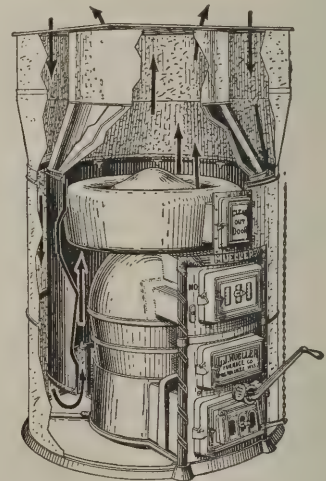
Broken View Showing the Mueller Pipeless Furnace
